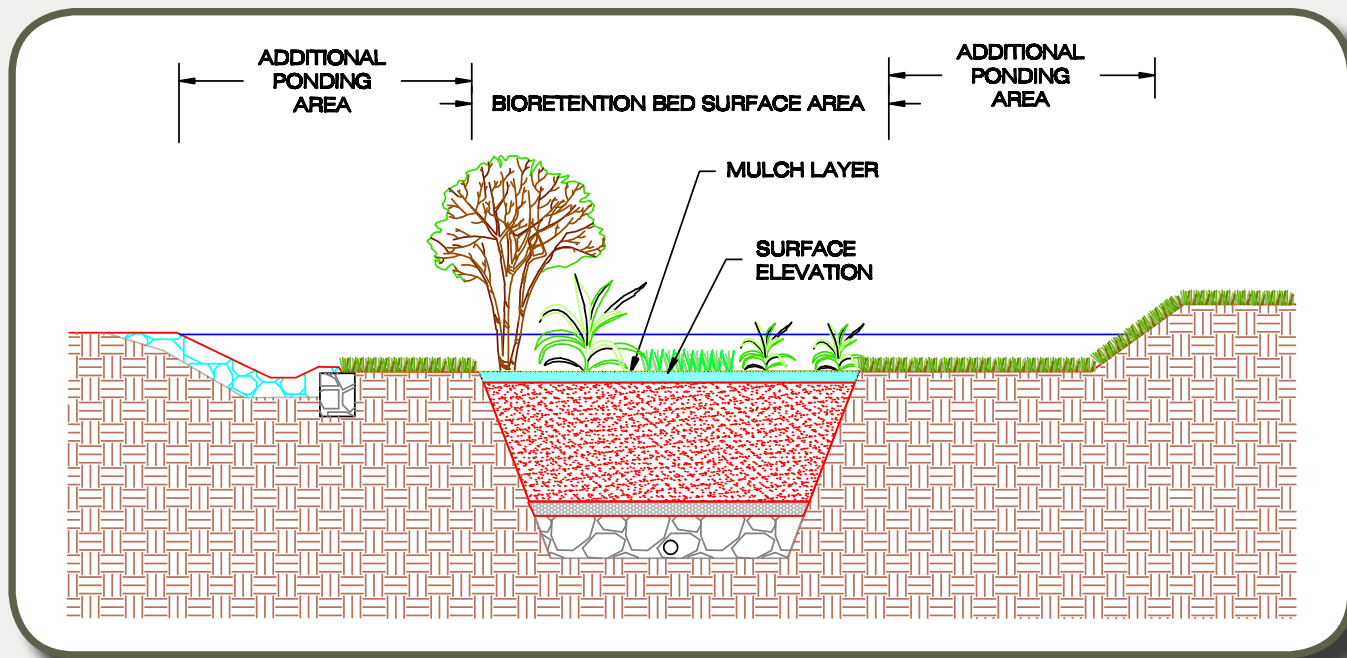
Typical section of Bioretention with additional surface ponding area
